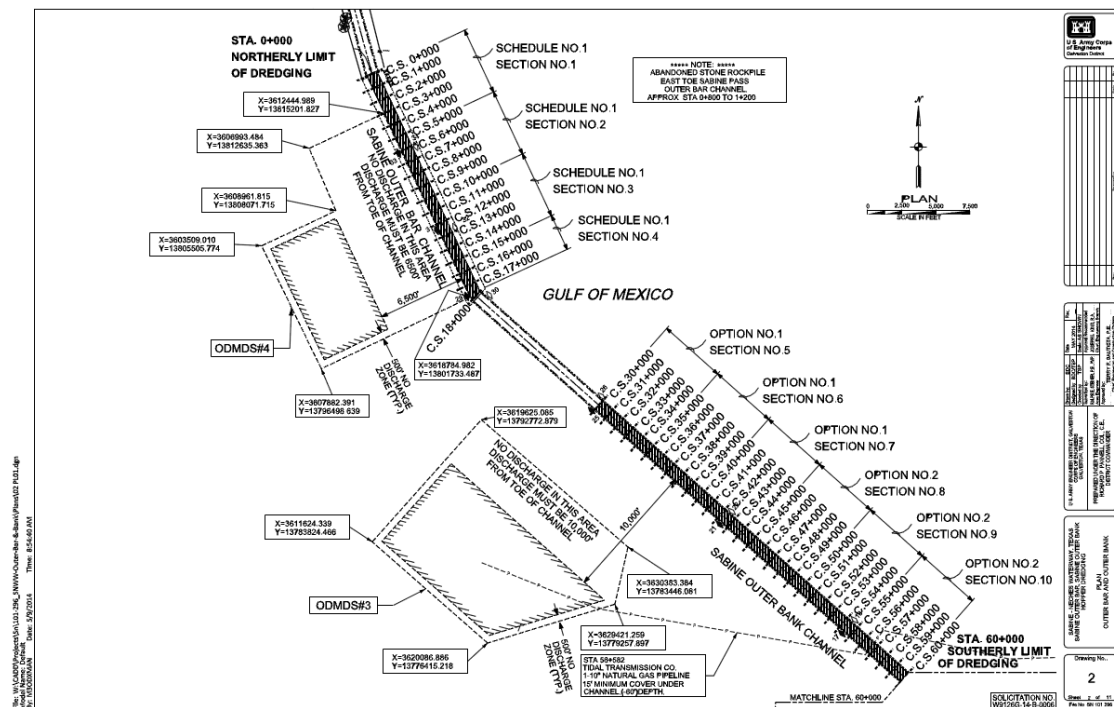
Plan View of Sabine Neches Waterway Dredging Project (USACE, 2014)
